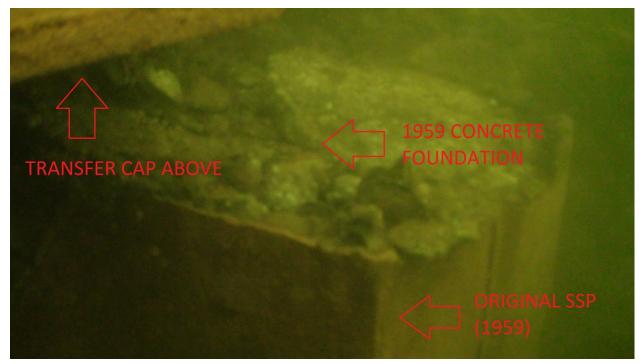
Typical condition of the concrete between original SSP and transfer cap.
